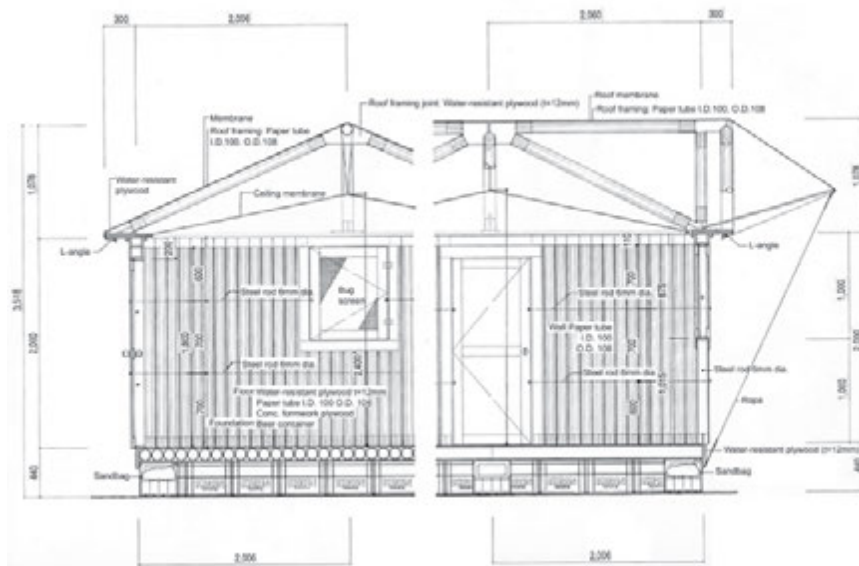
Paper Log House in Kobe, Japan – detailed section, 1995
